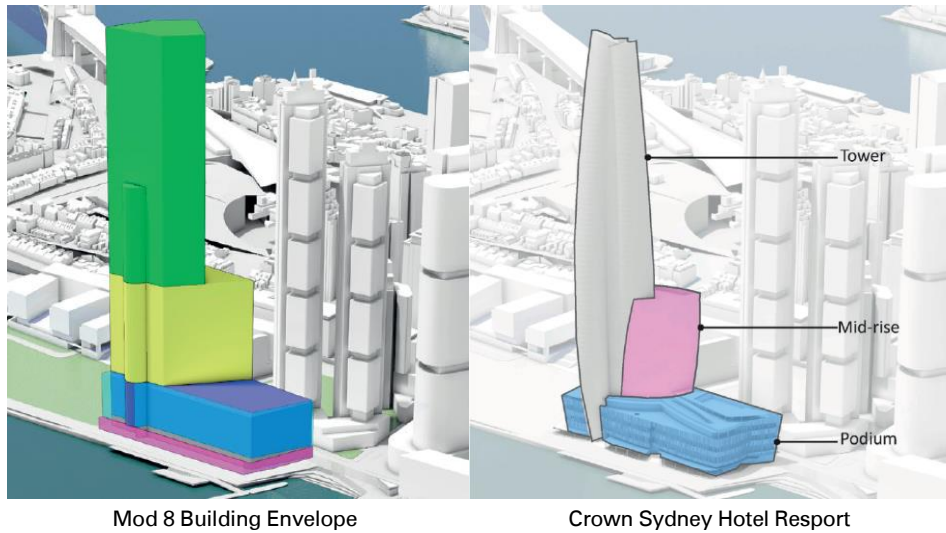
Concept Plan (Mod 8) Building Envelope vs proposed CSHR building
